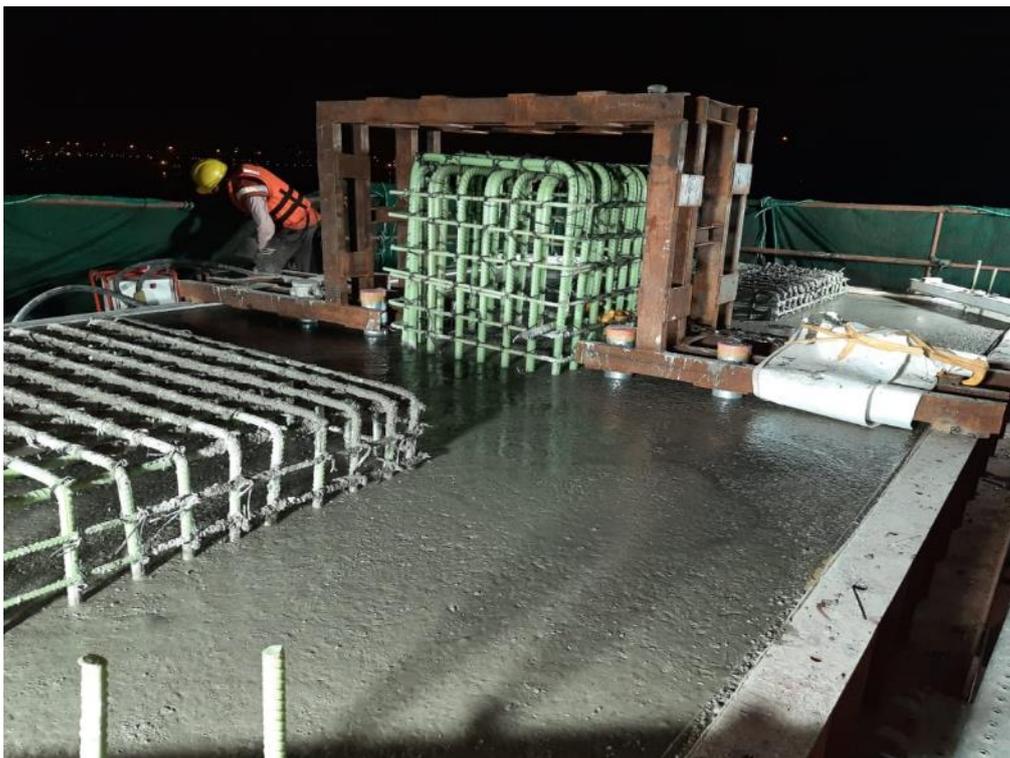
MP97 N Pier Cap Concreting Works at Marine Section in progress
